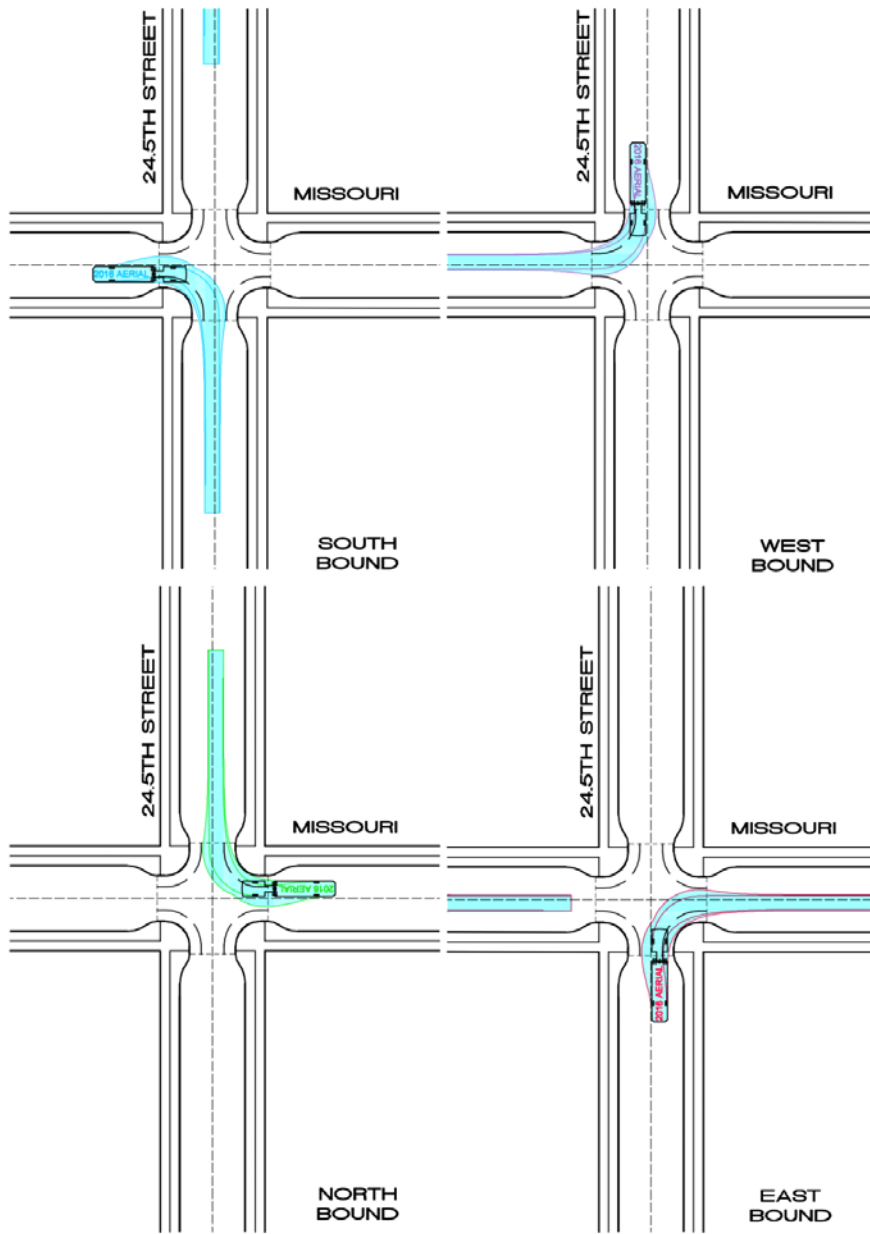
Typical Intersection Detail with Fire Truck Turning 2016 Aerial
